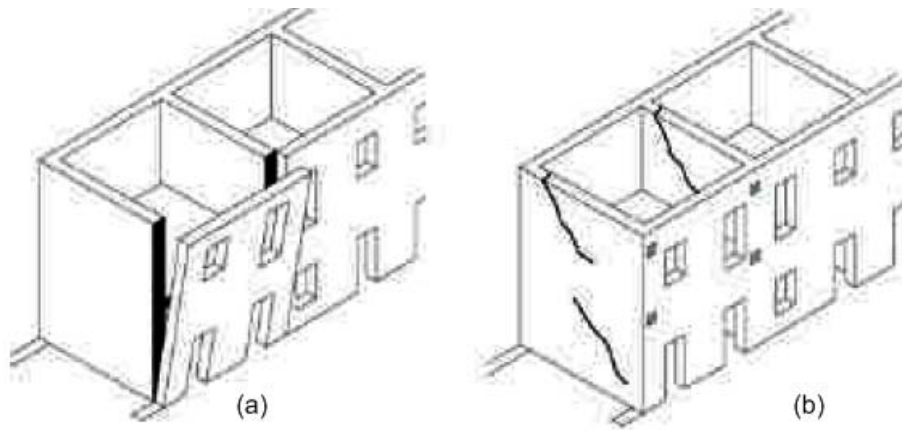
Damage modes in masonry buildings. Out-of-plane masonry wall failure (a) and in-plane (shear) cracking (b). (b) shows wall ties securing the front facade from out-of-plane failure, which then imparts a greater load to the in-plane walls, initiating cracking (Decanini *et al.*, 2004).
